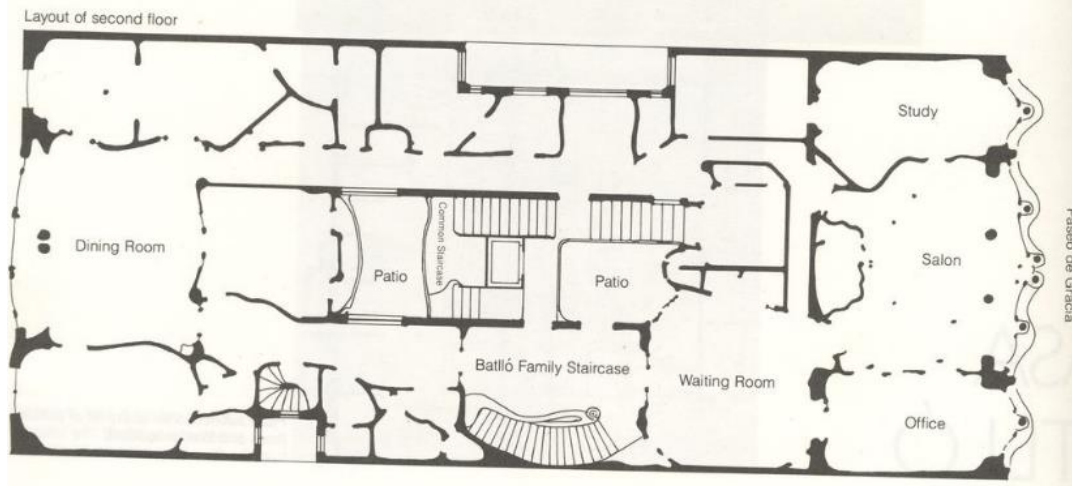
3. Casa Batlló, Plan of the second floor (Source: Shimomura, 1992 , p.50)
